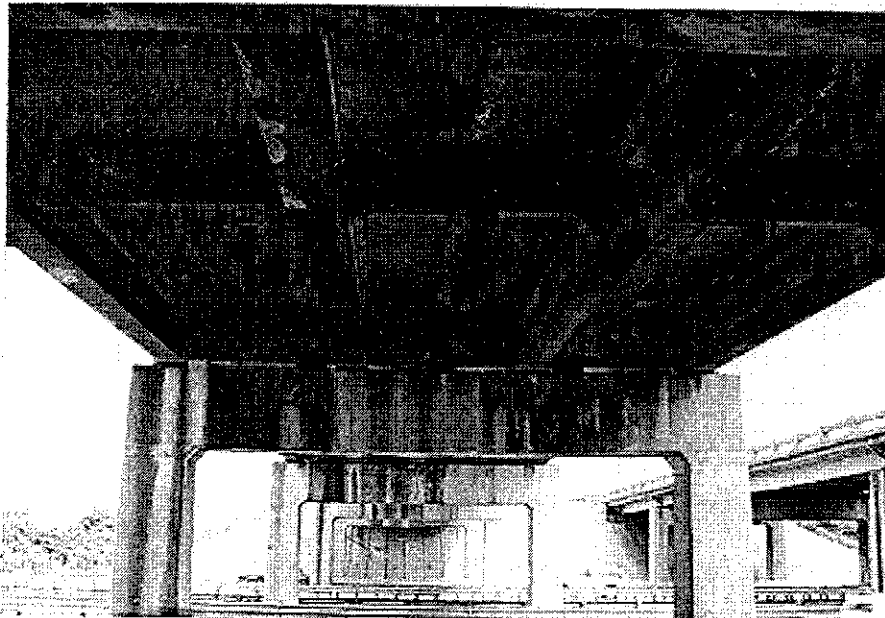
Over land bridge located on the city of Tampa (West bound I-4 over Orient road, built in 1961).
